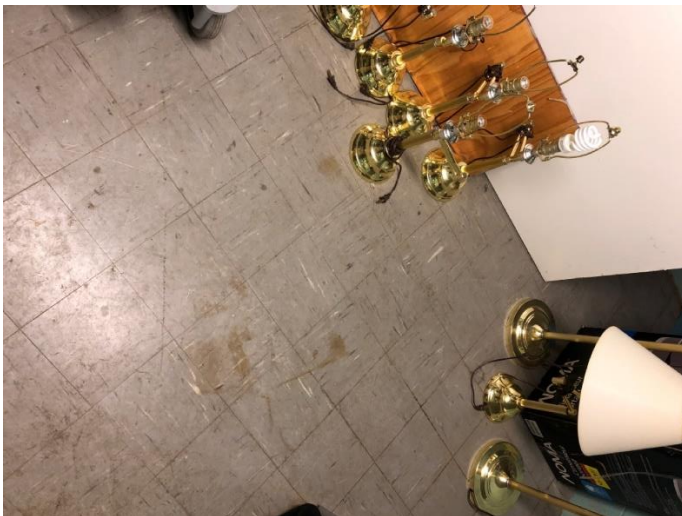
View of asbestos-containing vinyl floor tiles (9"x9"- grey with grey/white streaks) observed in Room 012.
